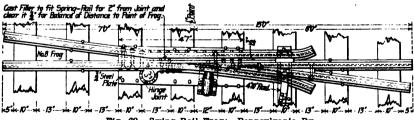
Swing-Rail Frog; Pennsylvania Ry.
